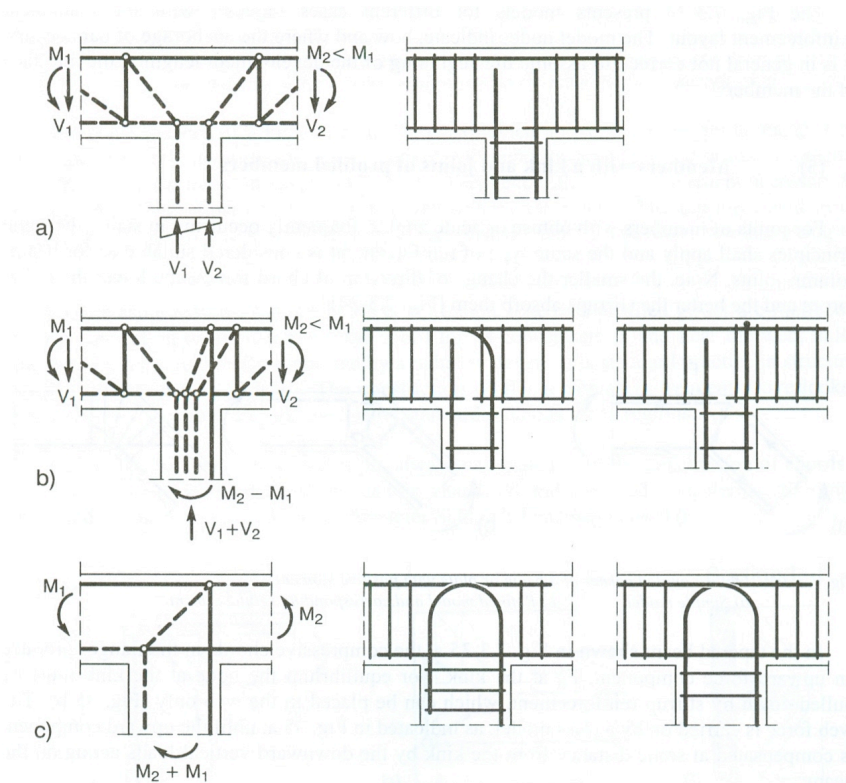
Beam-column-joints. Models and corresponding reinforcement layout.
